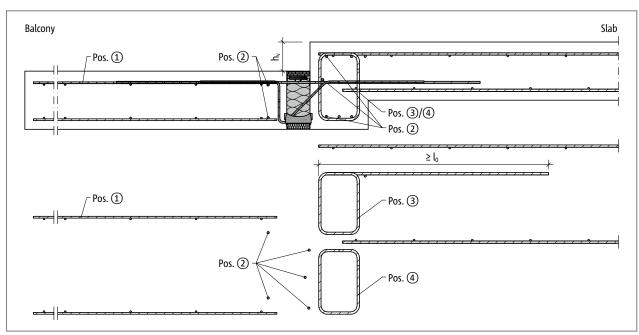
Schöck Isokorb® T type K: On-site reinforcement for small height offset
